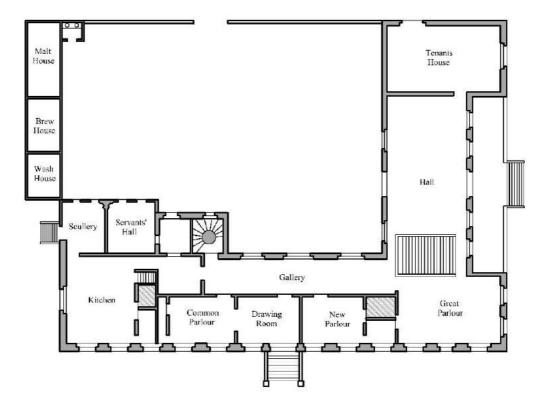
A ground plan of the lost Wormbridge House, re-drawn from a plan dated 1742 held in the British Museum
